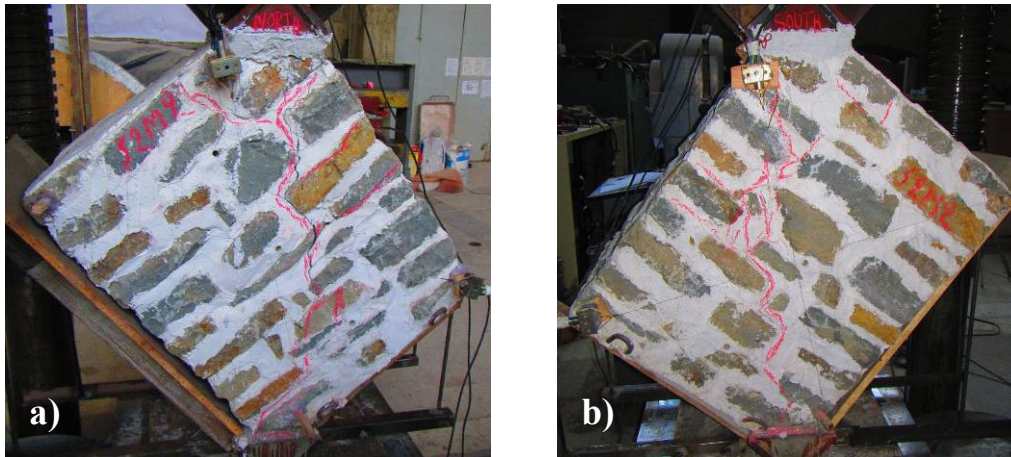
Modes of diagonal cracking during the diagonal compression test of the stone masonry specimens on façade (a -North) and facade (b - South).
